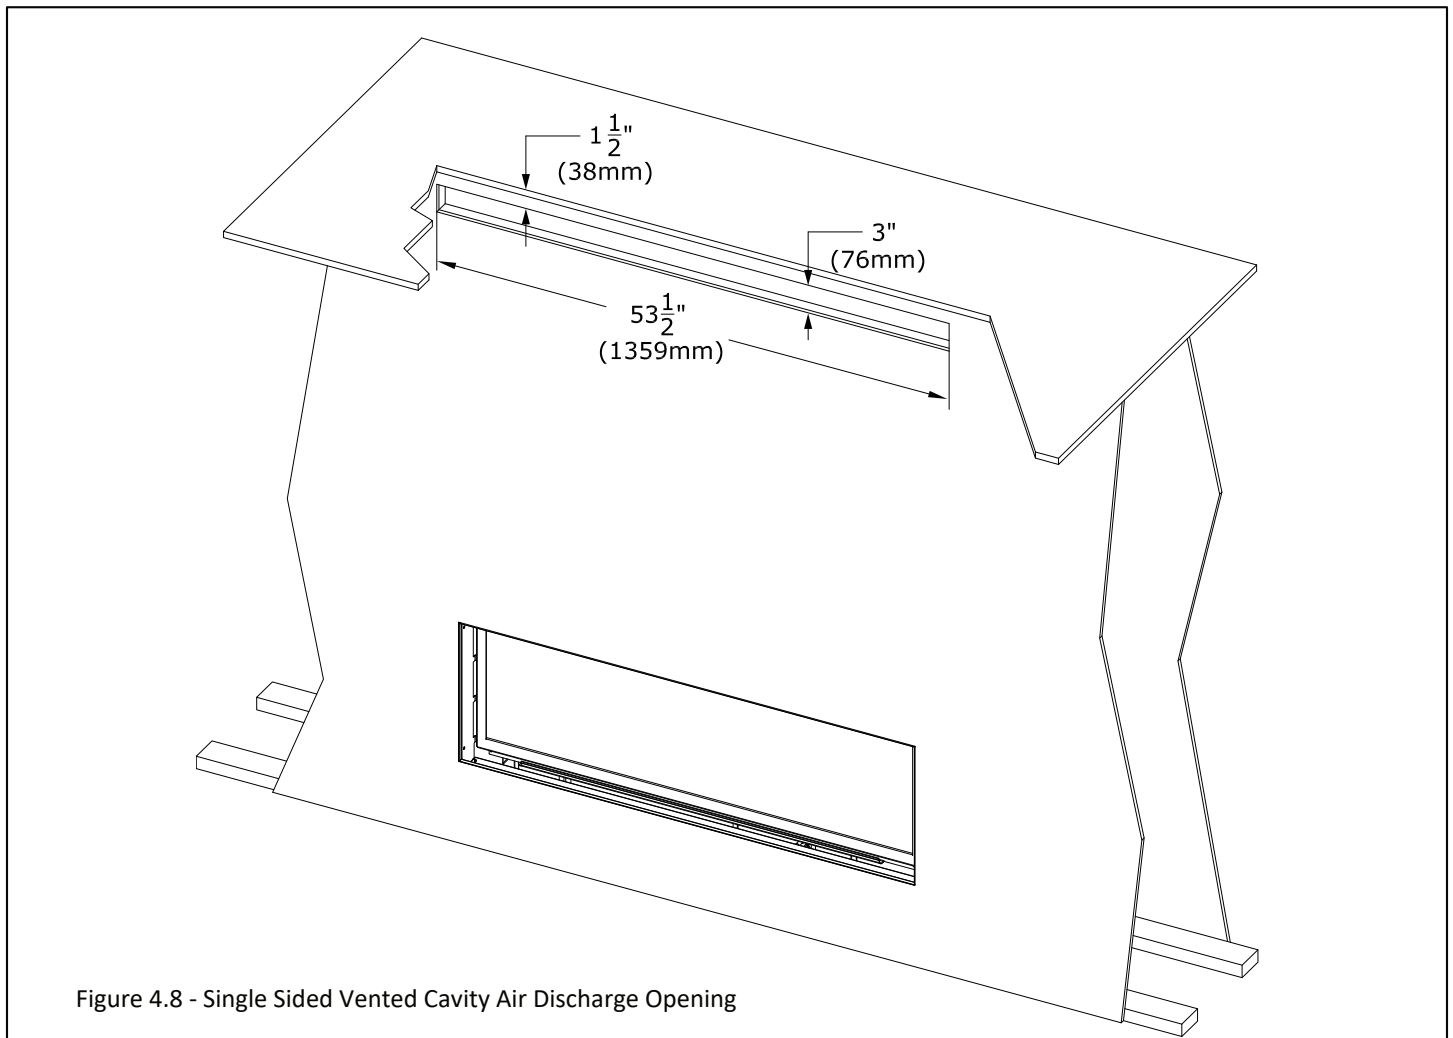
Single Sided Vented Cavity Air Discharge Opening
